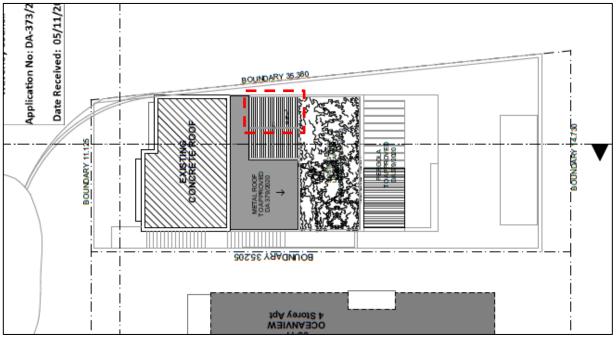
Excerpt of the proposed works to the ground floor level deck under the subject application outlined in red.
